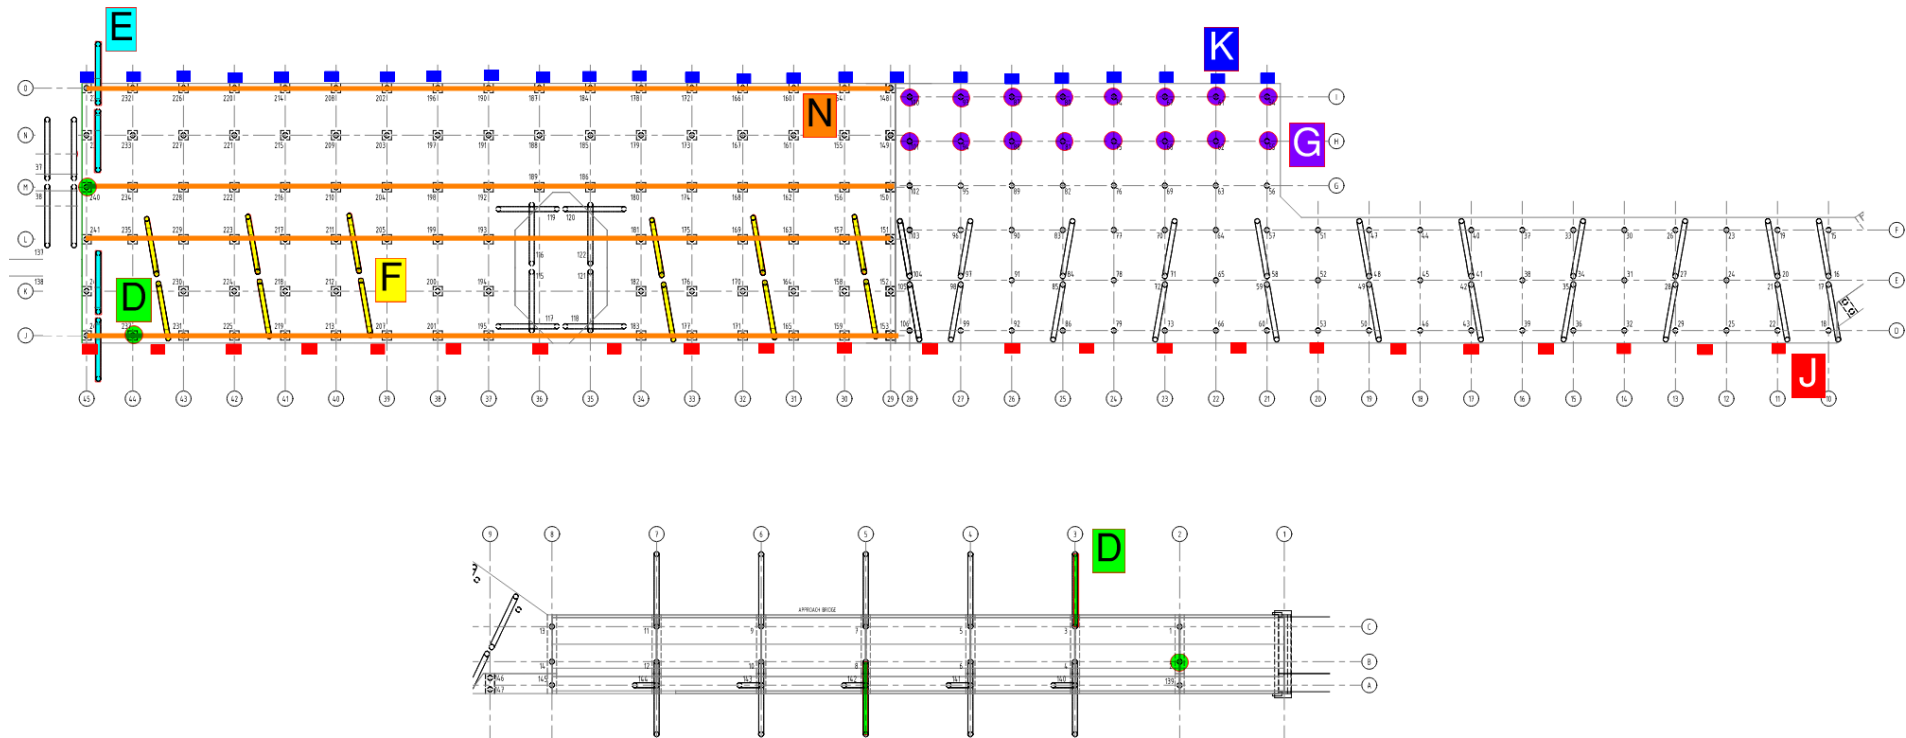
Proposed Works to Upgrade Wharf (refer Table 41 for detail)
